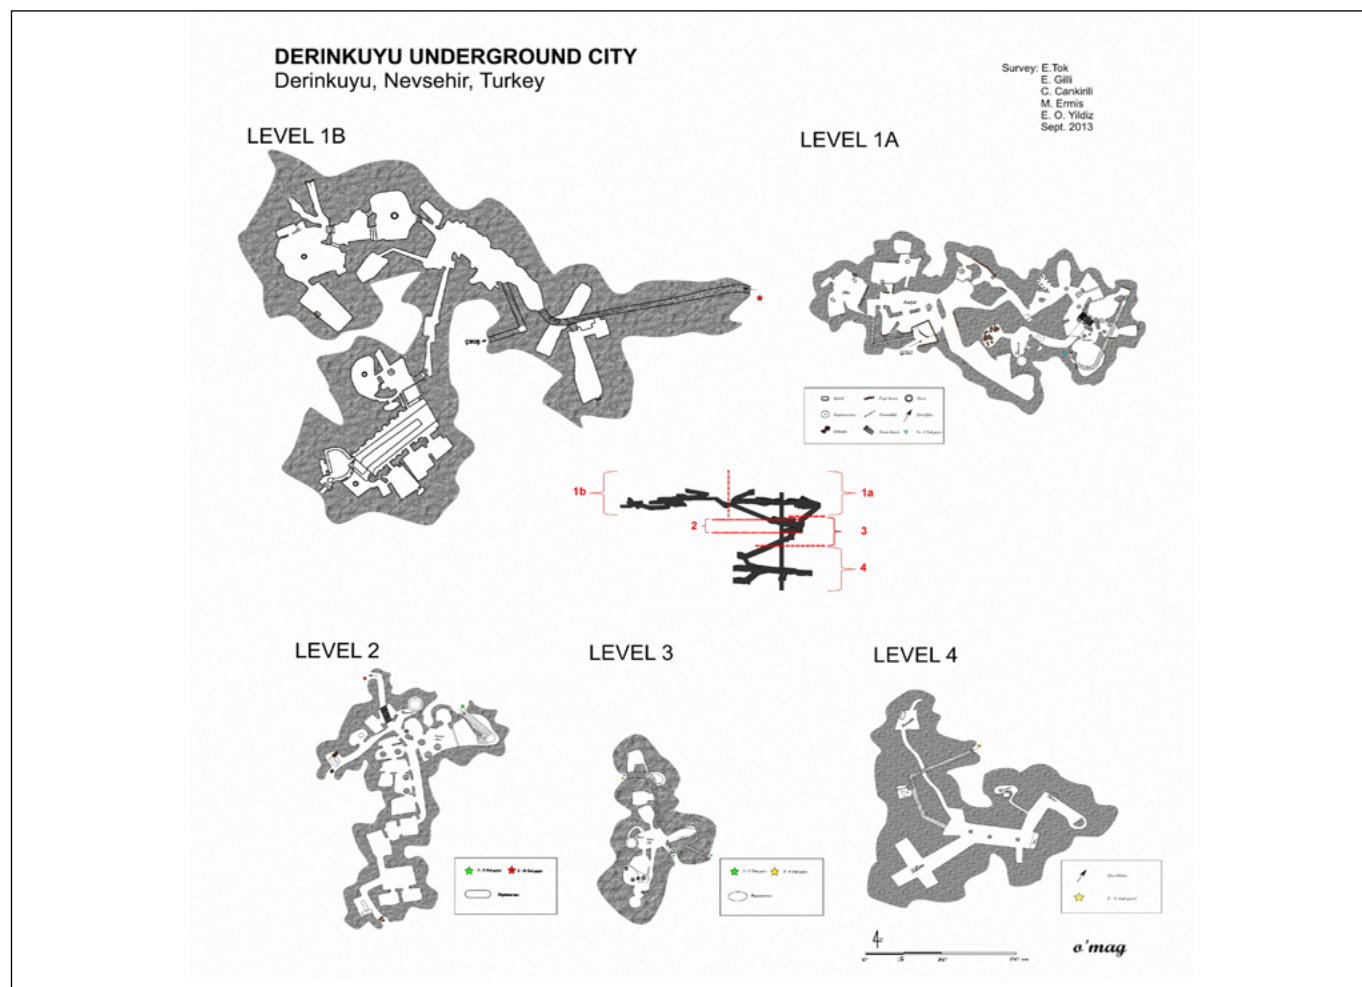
plan of Derinkuyu Underground City (drawing E. Tok).
